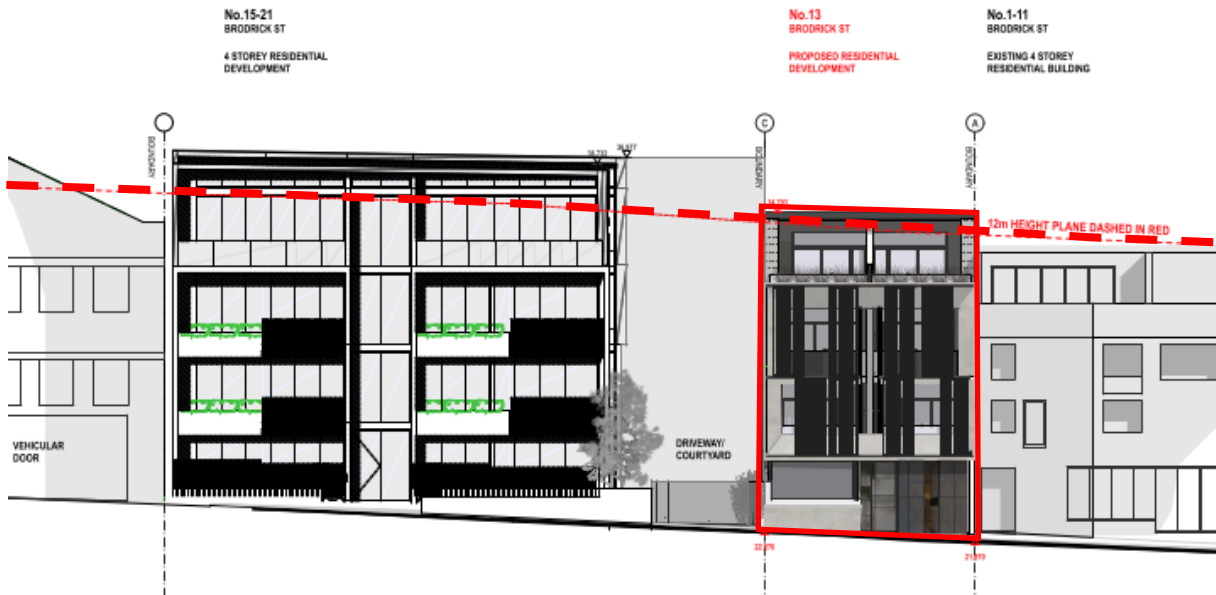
Brodrick Street elevation. Subject site is identified by a red line
